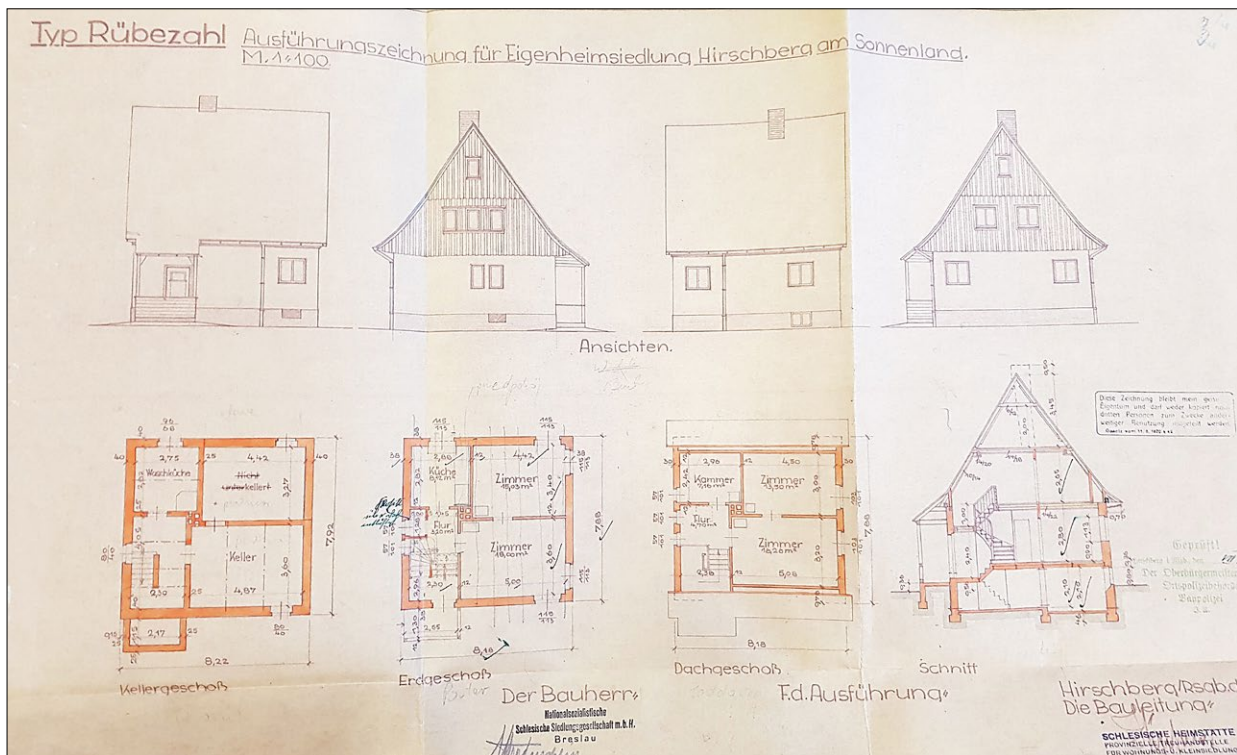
Hans Höpfner, "Rübezahl" house design: facade view, basement, ground floor and attic floor plans, cross-section; source: APW o. JG.
